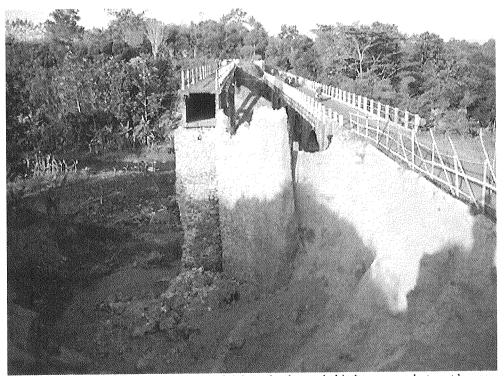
Mataram canal bridge: Soil mass of right embankment behind masonry abutment has gone.
